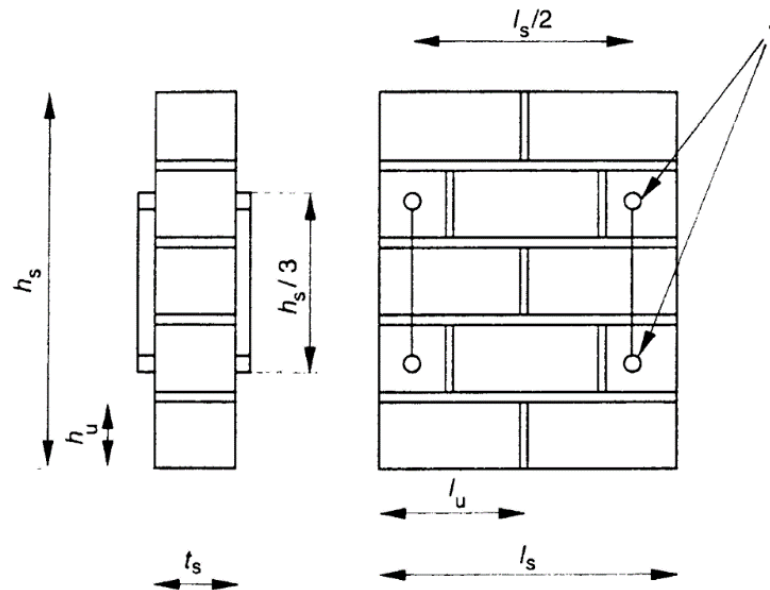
Recommended Masonry Specimen in Testing BS EN 1052-1:1991
